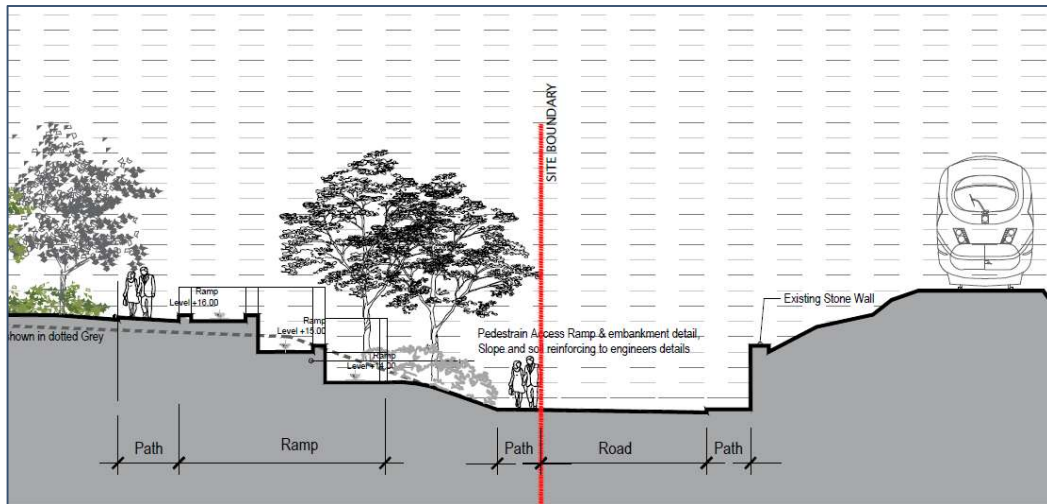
Ramp detail as shown on Stage 2 drawings (extract from drawing 18128-3013)
